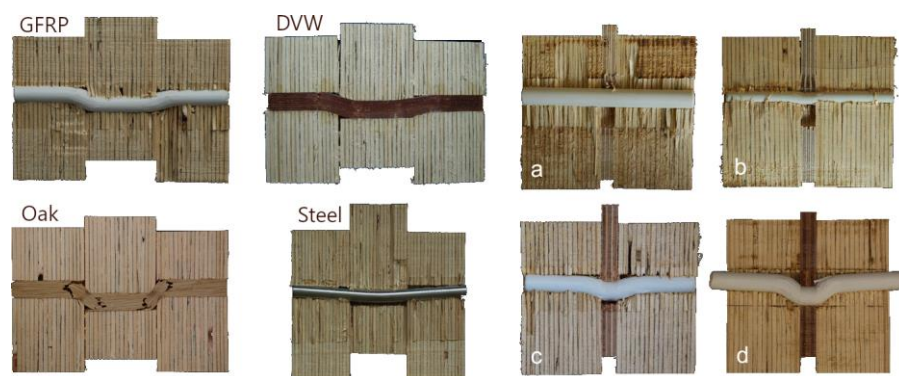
Failed timber-to-timber and panel-to-timber (with GFRP dowels) connections in tests performed by Thomson (2010).
